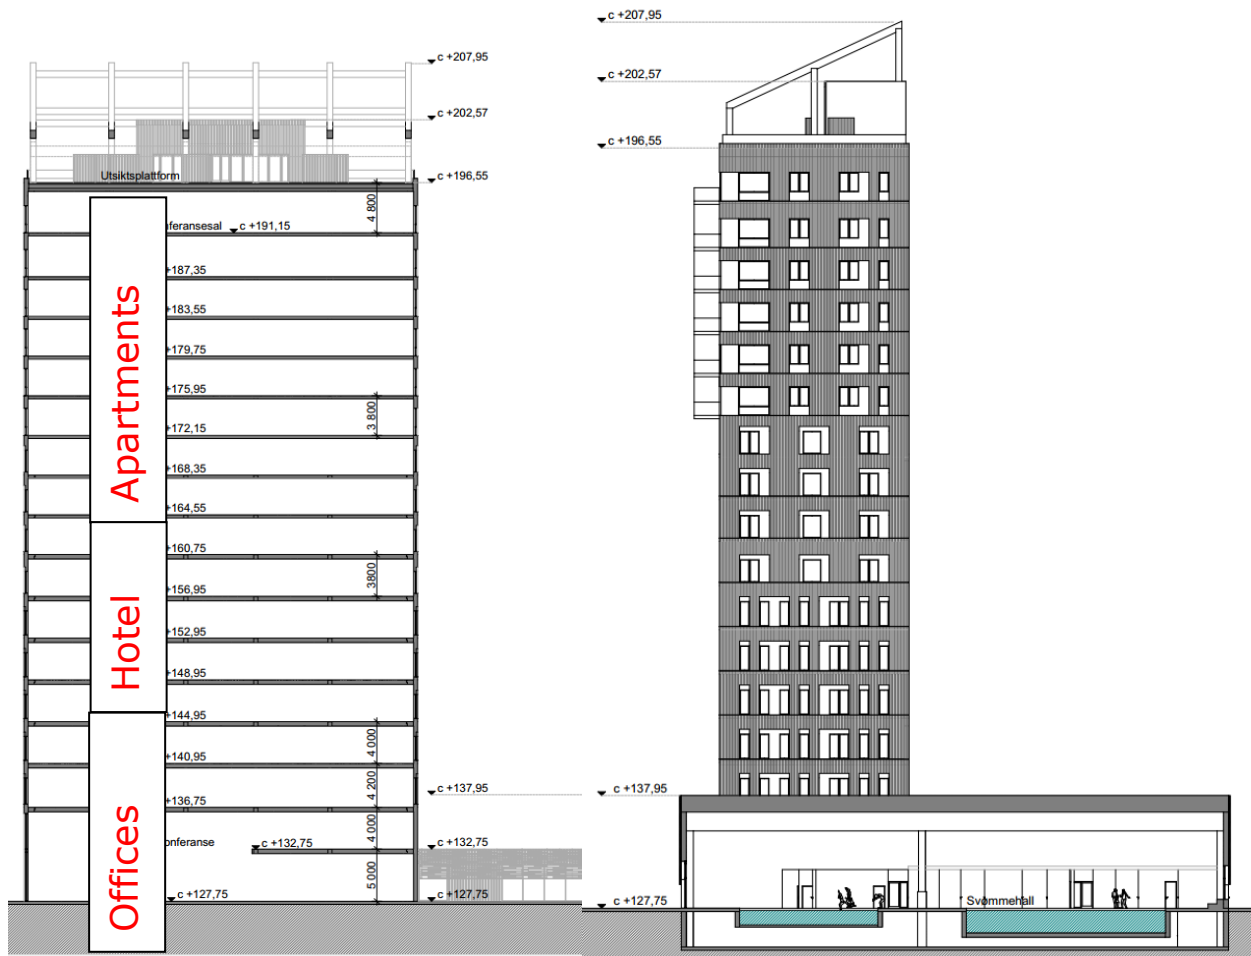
Typical sections for Mjøstårnet. Please note that the final elevations are somewhat different to what is shown here
